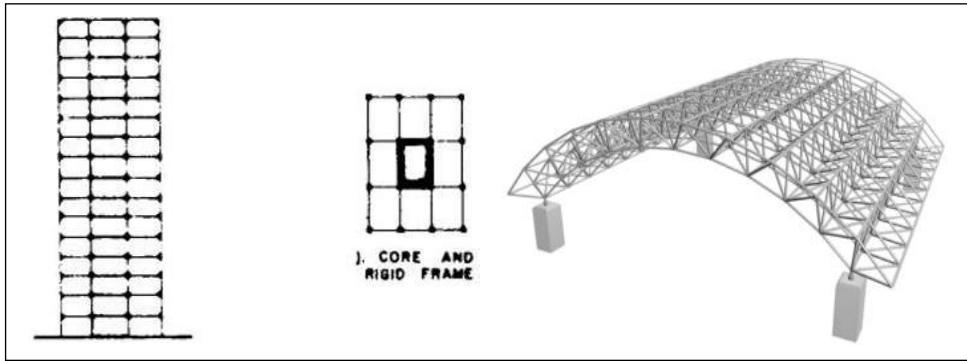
Rigid Frame, Core and Space Frame Roof Structure
